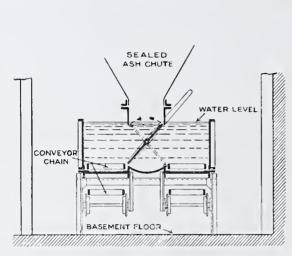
The Usco Ash Conveyor, Standard Arrangement.
